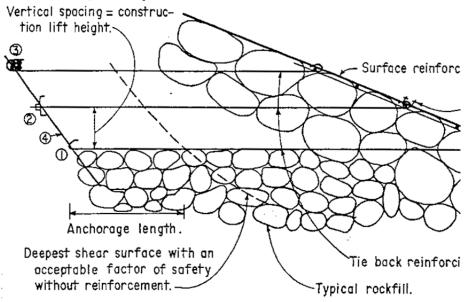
Schematic detail of tie-back steel reinforcing bars with end-anchorage alternatives (Courtesy of Brown et al., 1983, all rights reserved). To resist through flow, reinforcement should extend well above the height of the predicted seepage exit elevation. To resist flow over an embankment, the reinforcement should extend over the entire downstream face, abutment to abutment, unless the embankment has been shaped to direct overtopping flows through a limited area. Designs should also assure crest stability during overtopping. Rockfill would be largest and reinforcement would be heaviest at the downstream toe of an embankment dam subject to overtopping.
